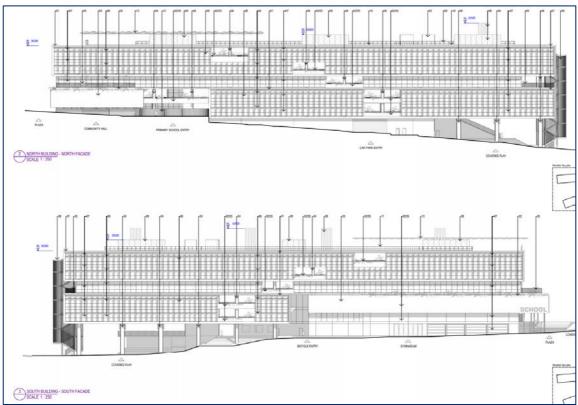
| Northern elevation of the north wing, fronting Rhodes Street (top), and southern elevation of the south wing, fronting the TAFE Green (bottom) (Source: Applicant's RtS 2020)
